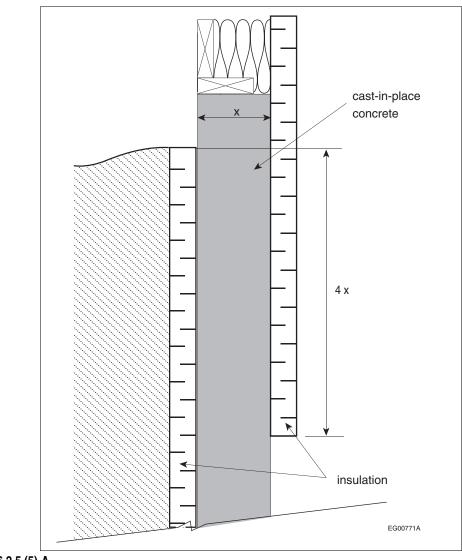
(5)-A Application of Sentence 9.36.2.5.(5) to a cast-in-place concrete foundation wall
